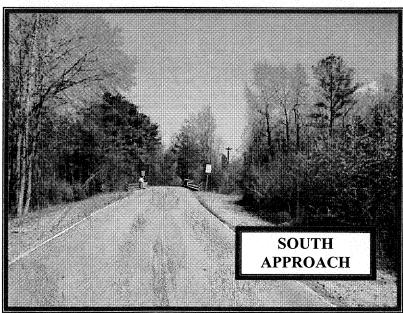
Figure 4 -Photographs of Bridge No. 11 Typical Roadway Section
